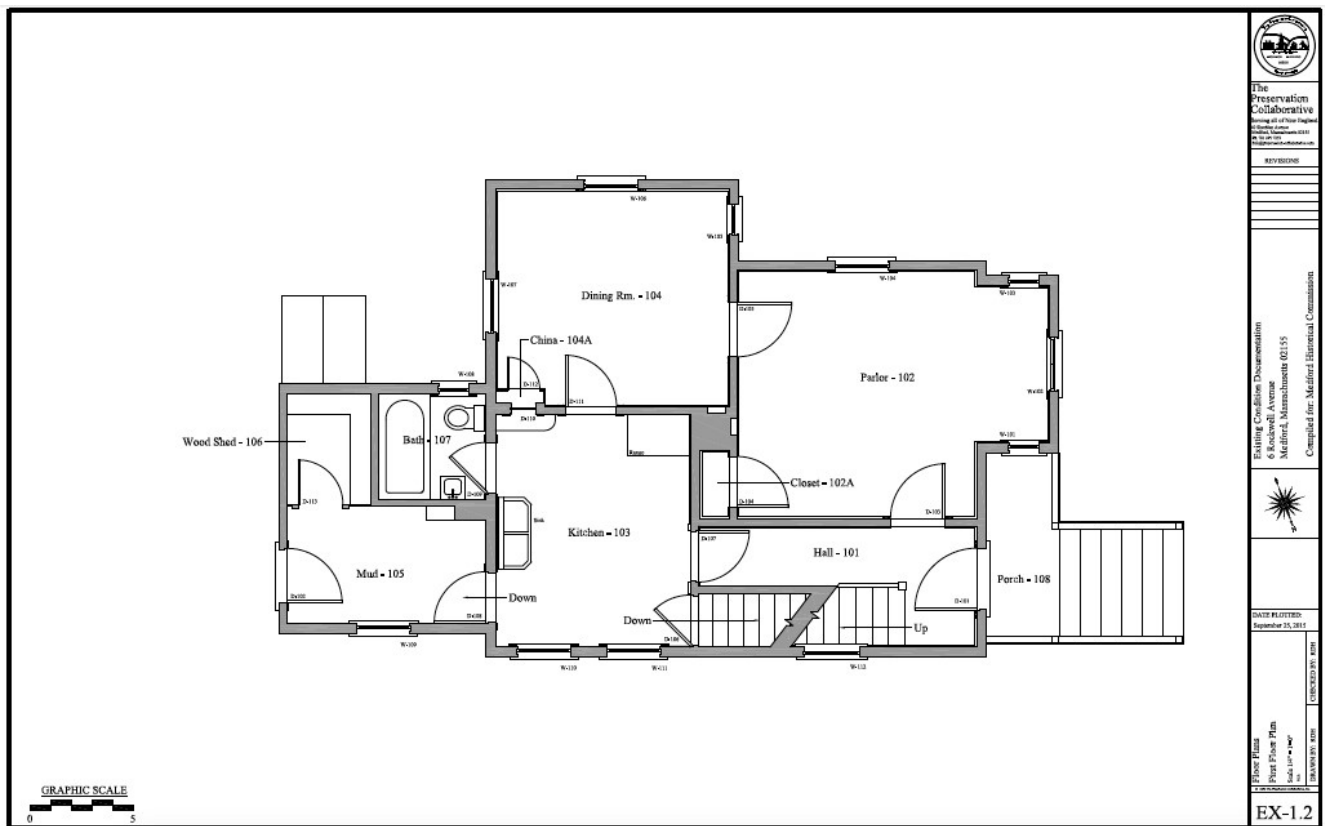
Ground floor plan, existing conditions. Drawing by Ryan Hayward.
